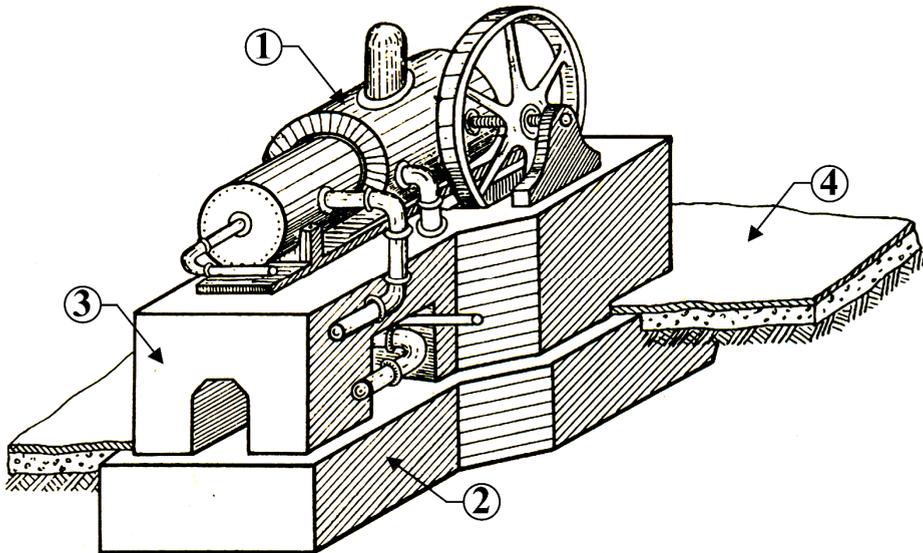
Block foundation for machine (Kral 1973); 1 – the machine, 2 – bottom slab of the foundation, 3 – upper part of the foundation, 4 – the floor of the room
